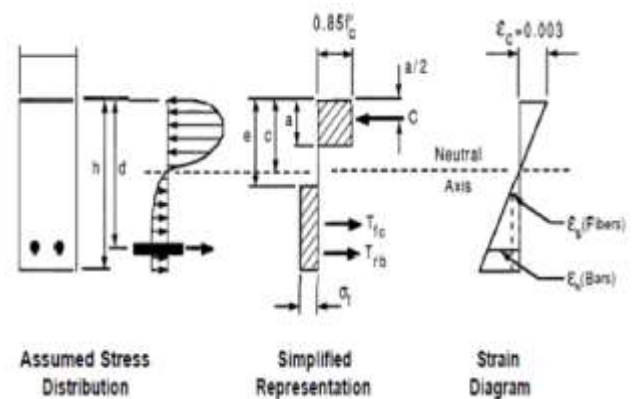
Design Assumptions for Analyzing the Single Reinforced Beams of Concrete, which Contain the Steel Fiber
